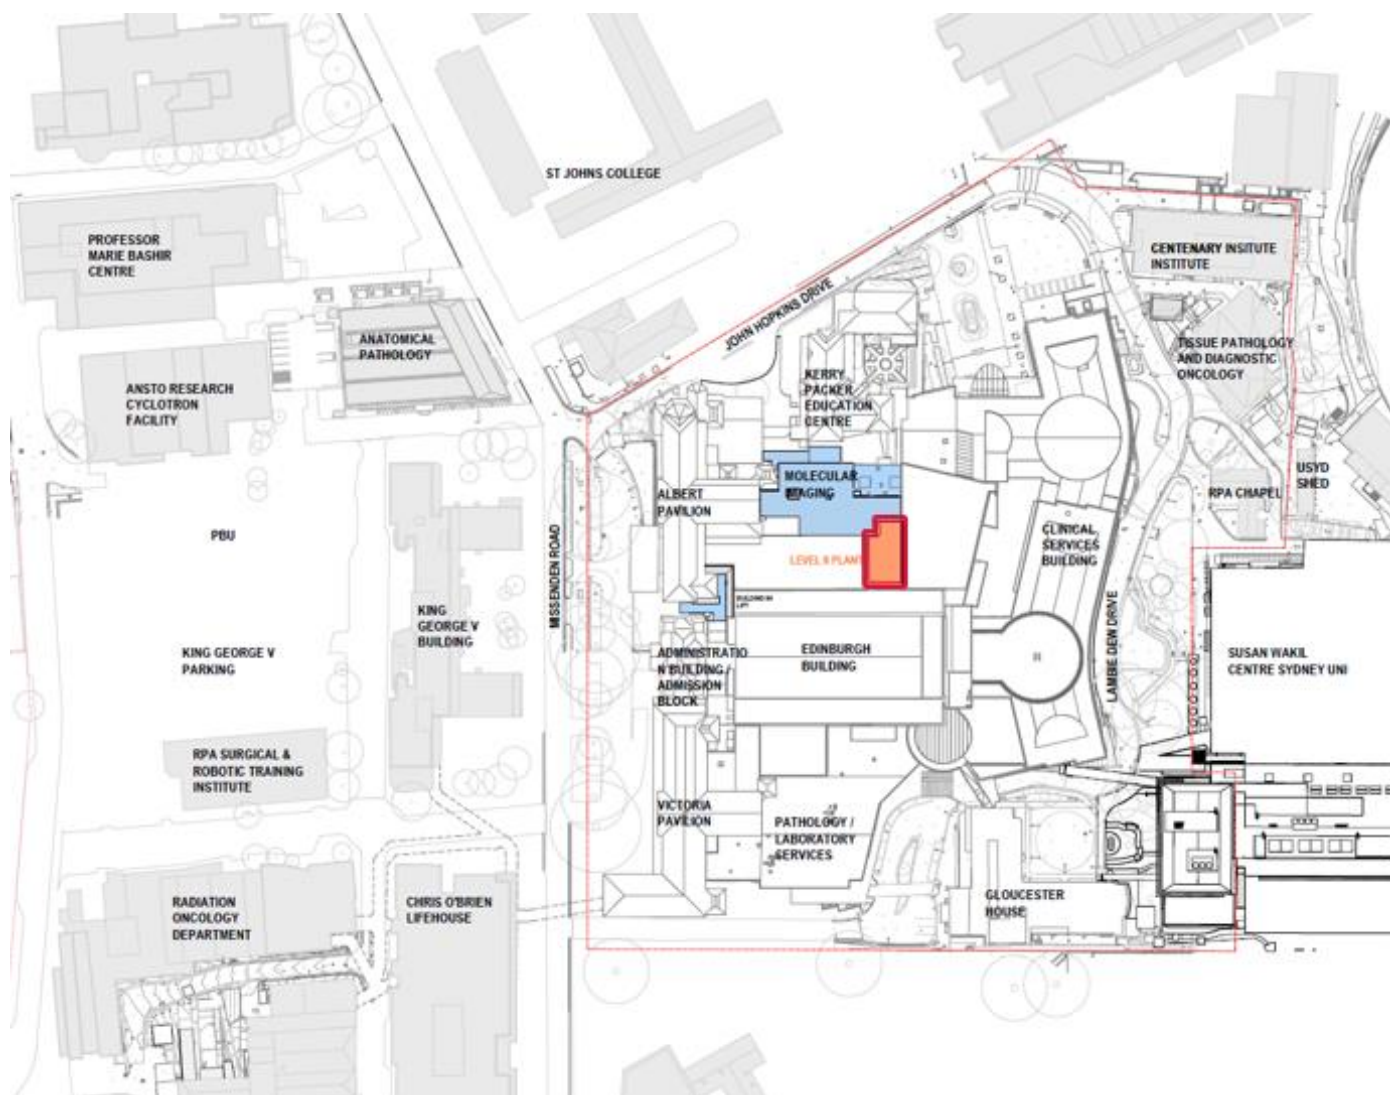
Overall Proposed Site Plan with plantroom outlined in red
